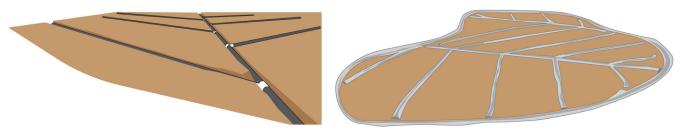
Drainage trench examples. (Skilled Trades BC, 2021) Used with permission.
